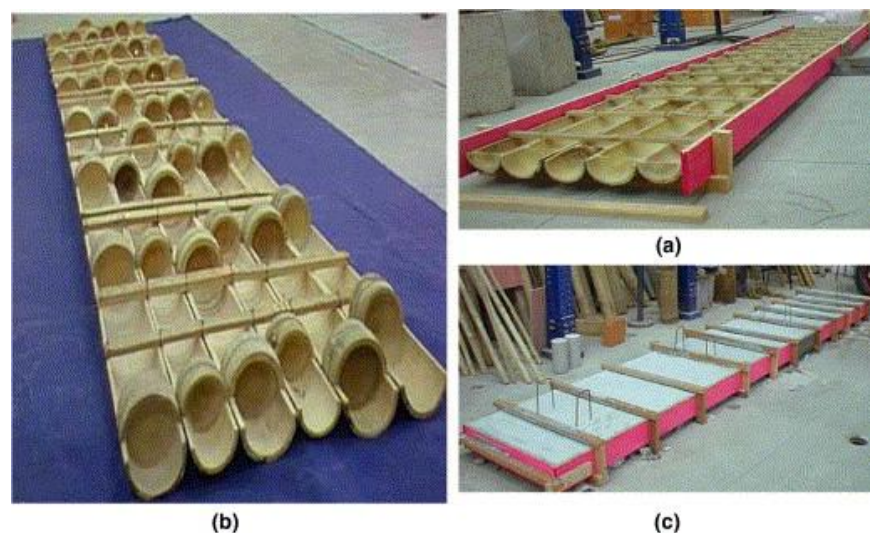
Concrete slabs reinforced with bamboo permanent shutter forms. (a) Half bamboo diaphragm as connector. (b) Second type of connector. (c) Slab before testing. (Ghavami, 2005)
